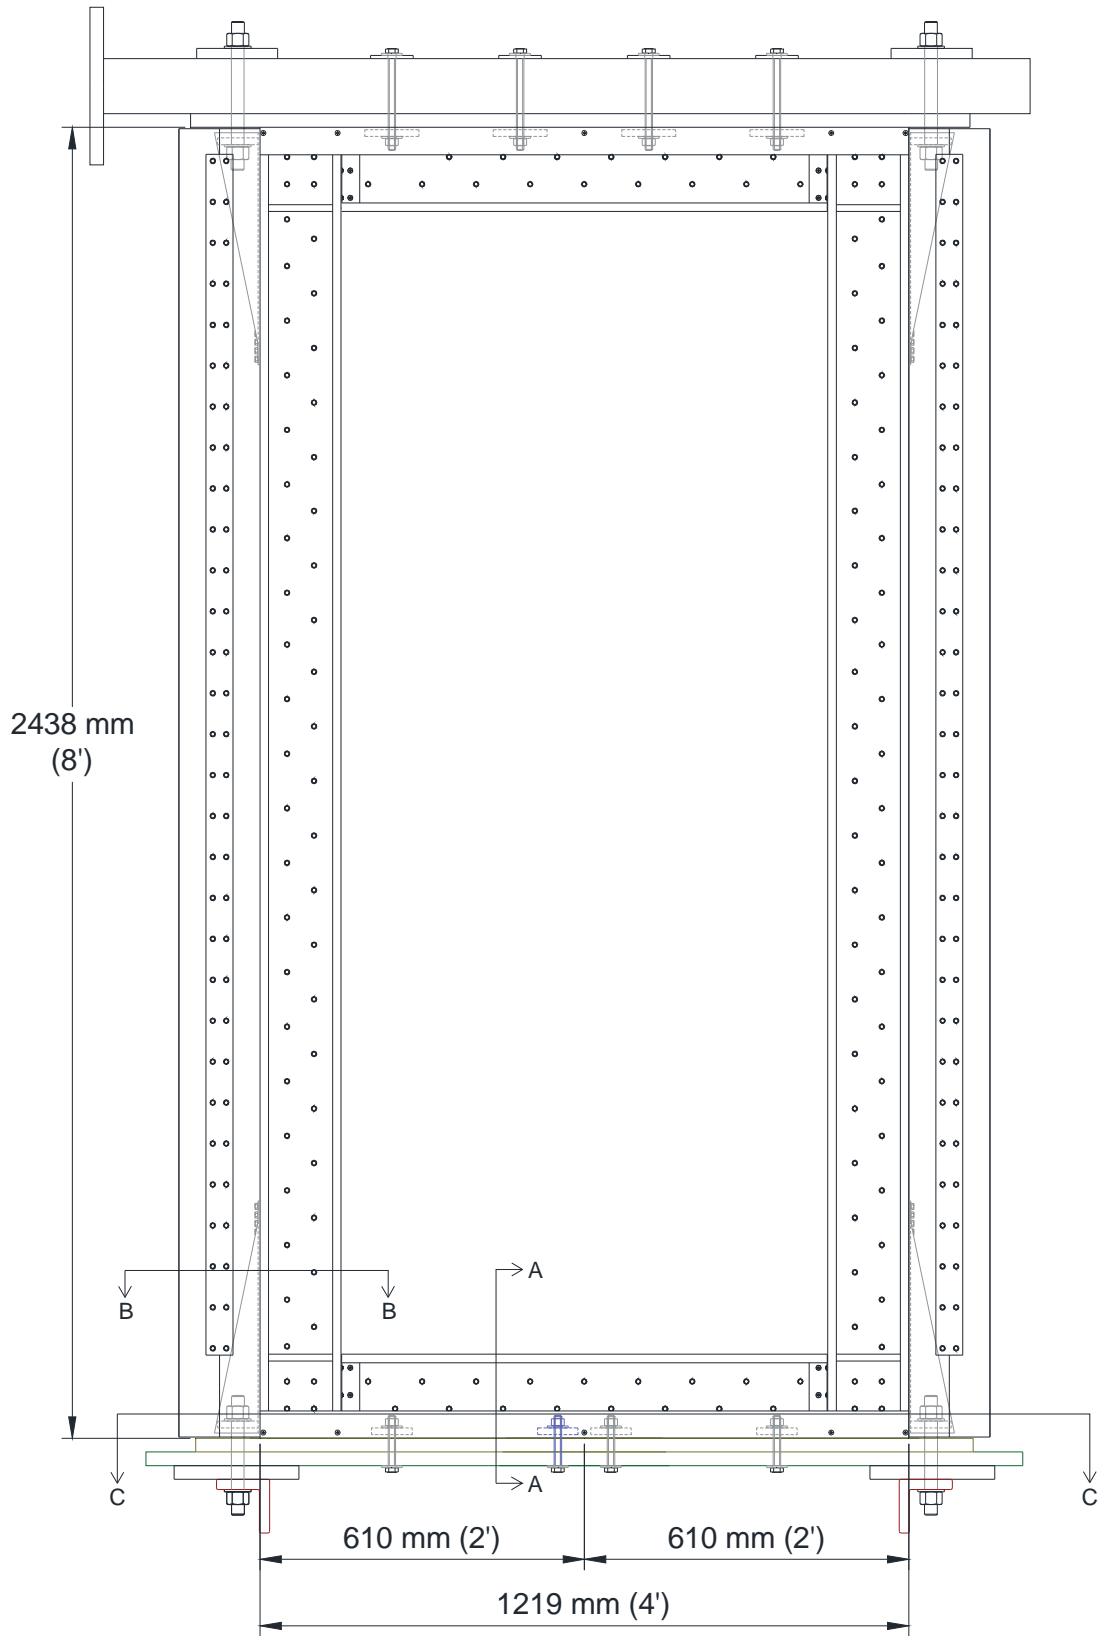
Centre-sheathed configuration: final level of reinforcement (R3) – elevation view
